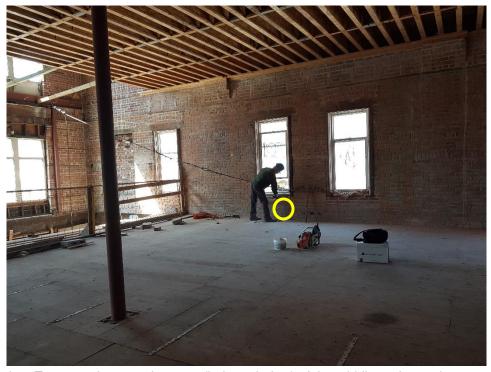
Test sample extraction area of the exterior wythe on the ground floor of the north elevation.
